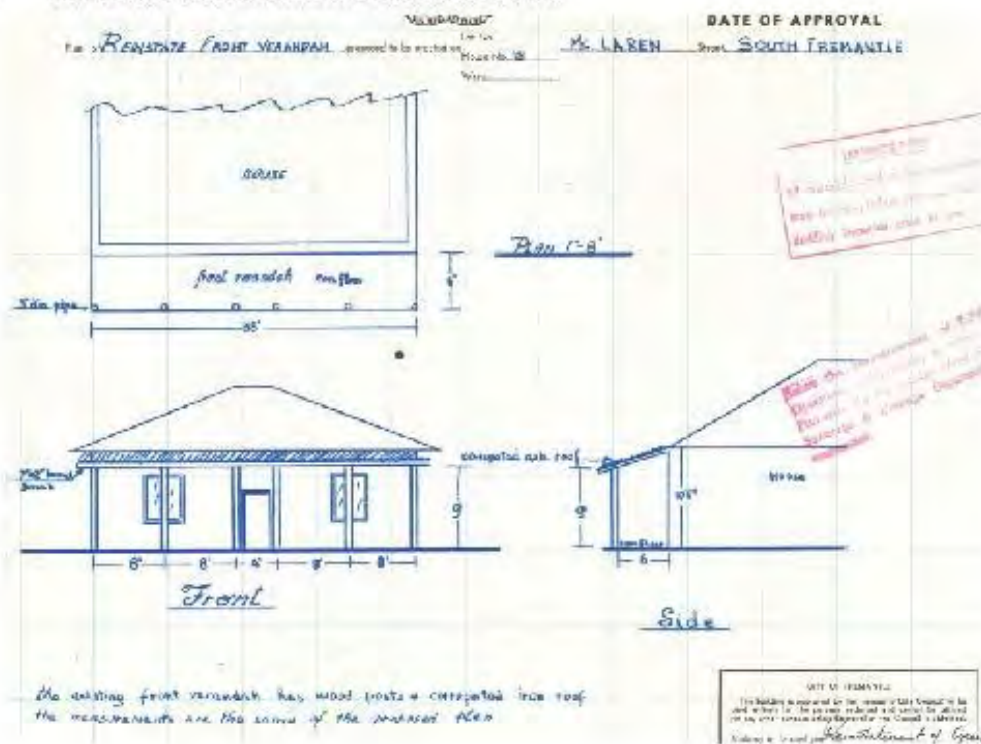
PLAN SHOWING 1963 VERANDAH REINSTATEMENT.
